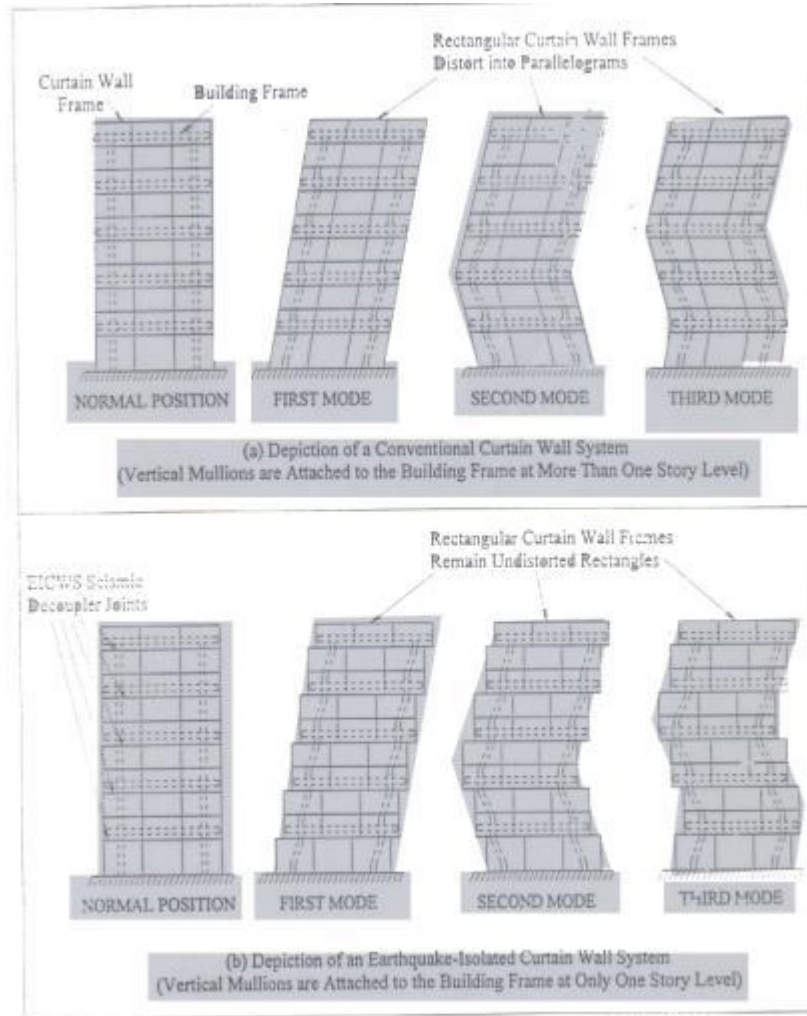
Schematic representation of fundamental vibration modes of a typical building frame: (a) clad with a conventional curtain wall system; and (b) clad with an Earthquake-Isolated Curtain Wall System.
